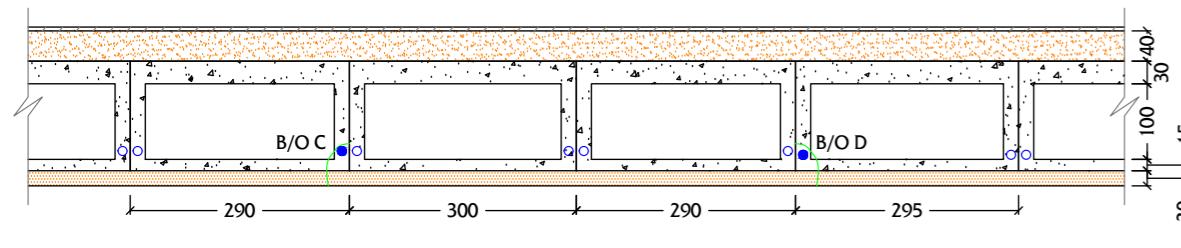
PART SECTION LOOKING EAST THROUGH ROOF SLAB SHOWING DETAILS OF PRECAST CONCRETE PLANK - SURVEY AREA RS3 SCALE 1:5
